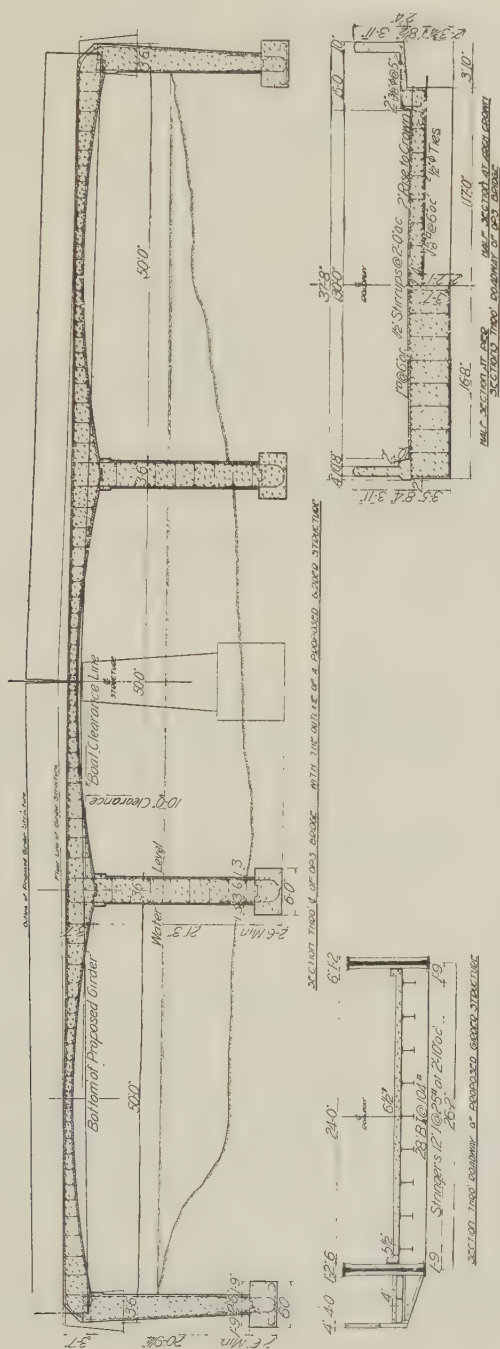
EXAMPLE OF RECENT ONTARIO HIGHWAY BRIDGE DESIGN—AN ALTERNATE GIRDER CONSTRUCTION IS OUTLINED
